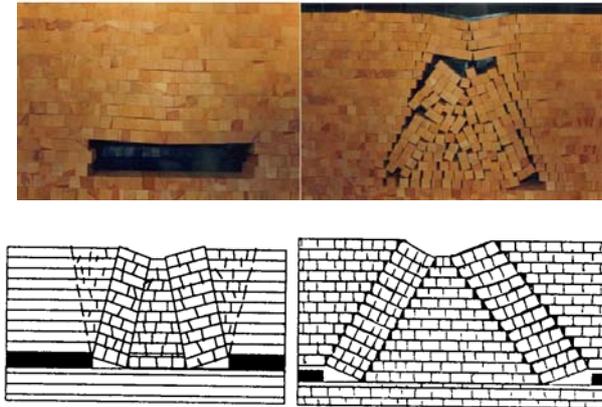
Views and illustrations of a rectangular underground opening in layered and jointed rock mass model.
